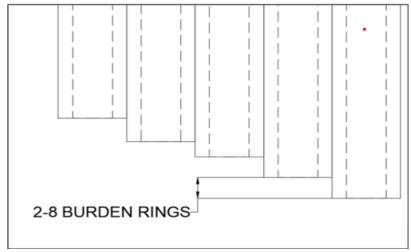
Horizontal Echelon – Plan View (N.T.S.)
